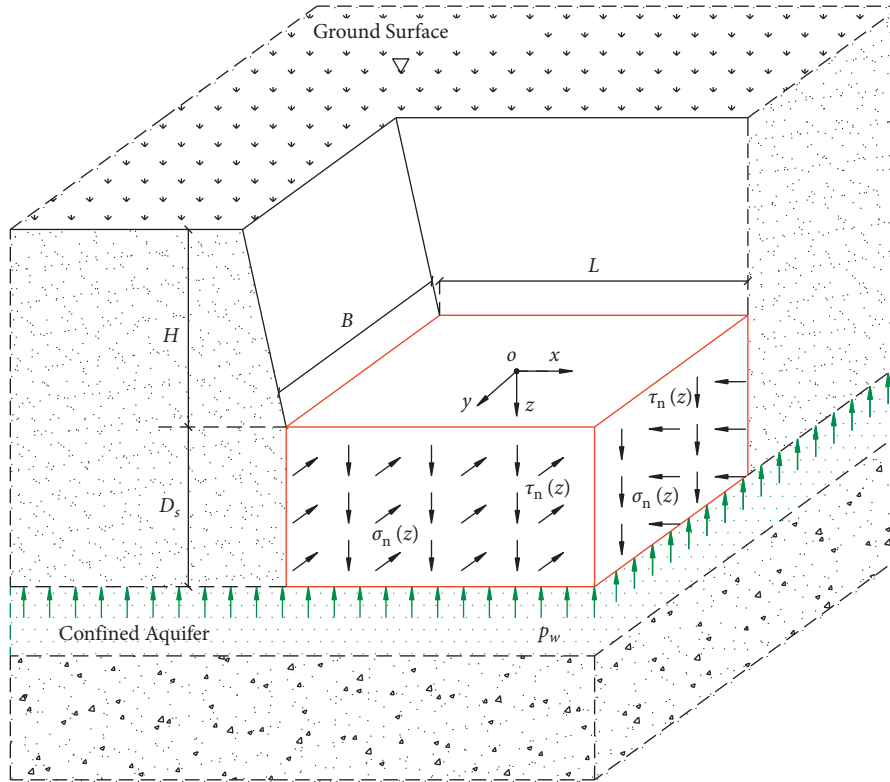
Inrush failure mechanism for a rectangular foundation pit.
